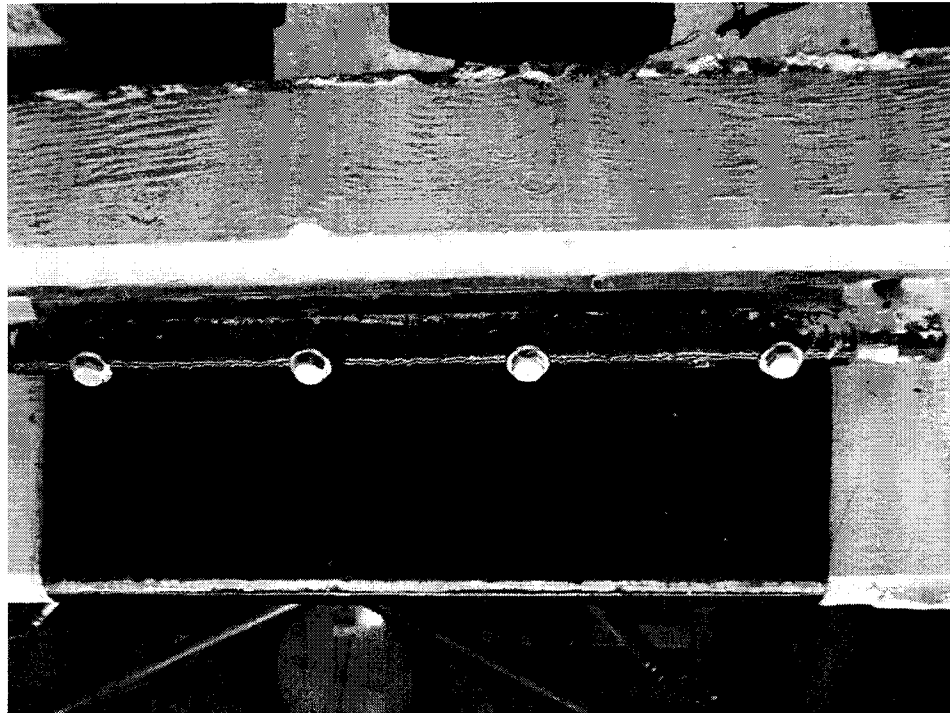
Elevation view of beam B-1 after installing the mechanical anchor
